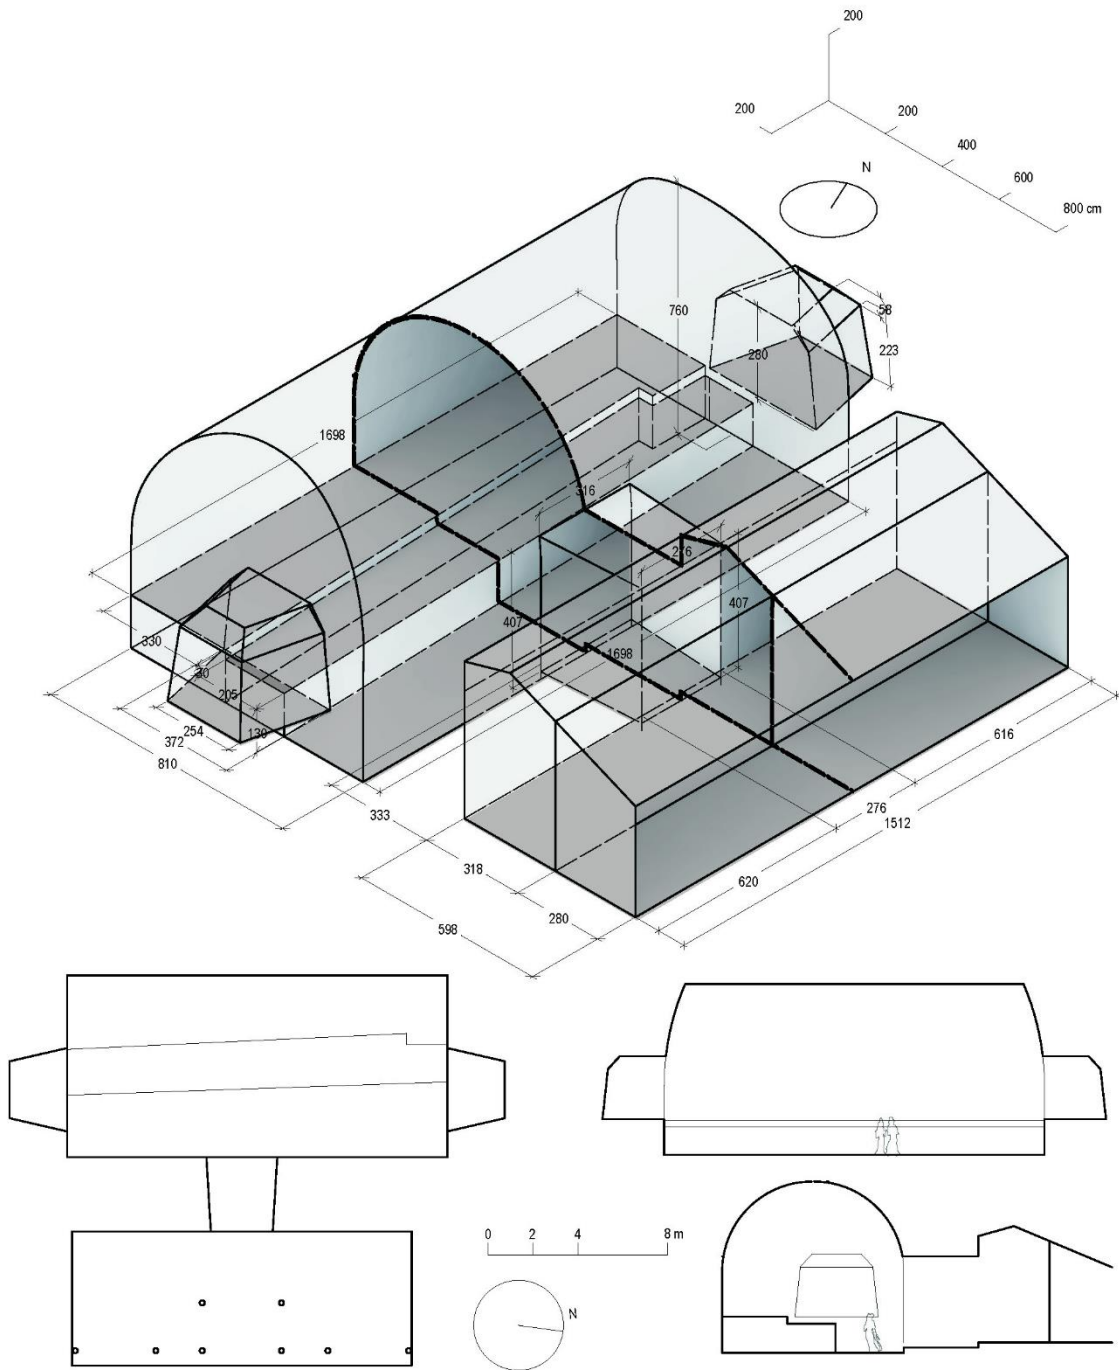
The plan, sectional, and isometric drawings of Cave 148, high-Tang period. Drawing by author.
